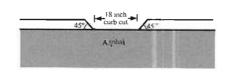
B. Curb-cut detail drawing for curbcutting permit, elevation views
